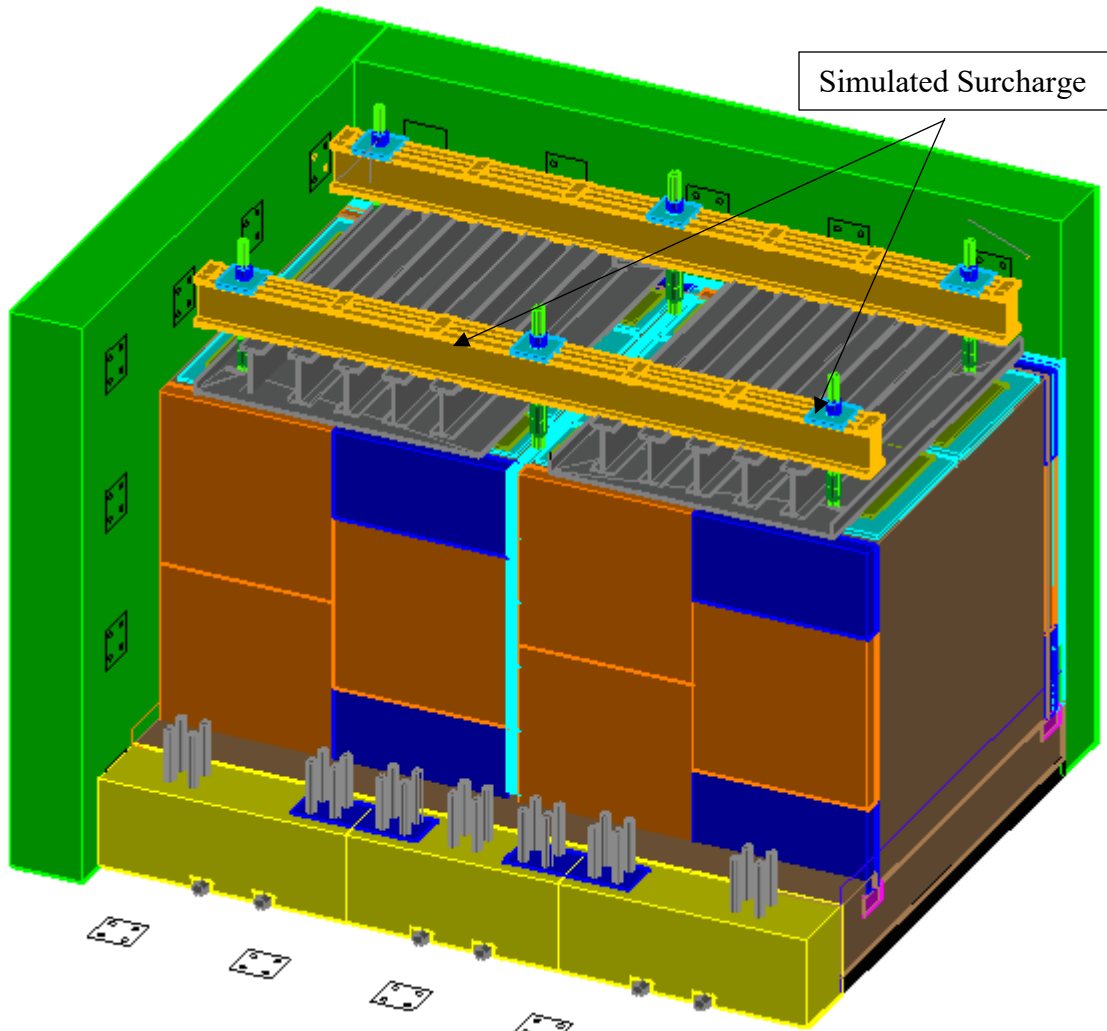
MSE-Strong Wall configuration with surcharge loading (Note: Right side Strong Wall is not depicted).
